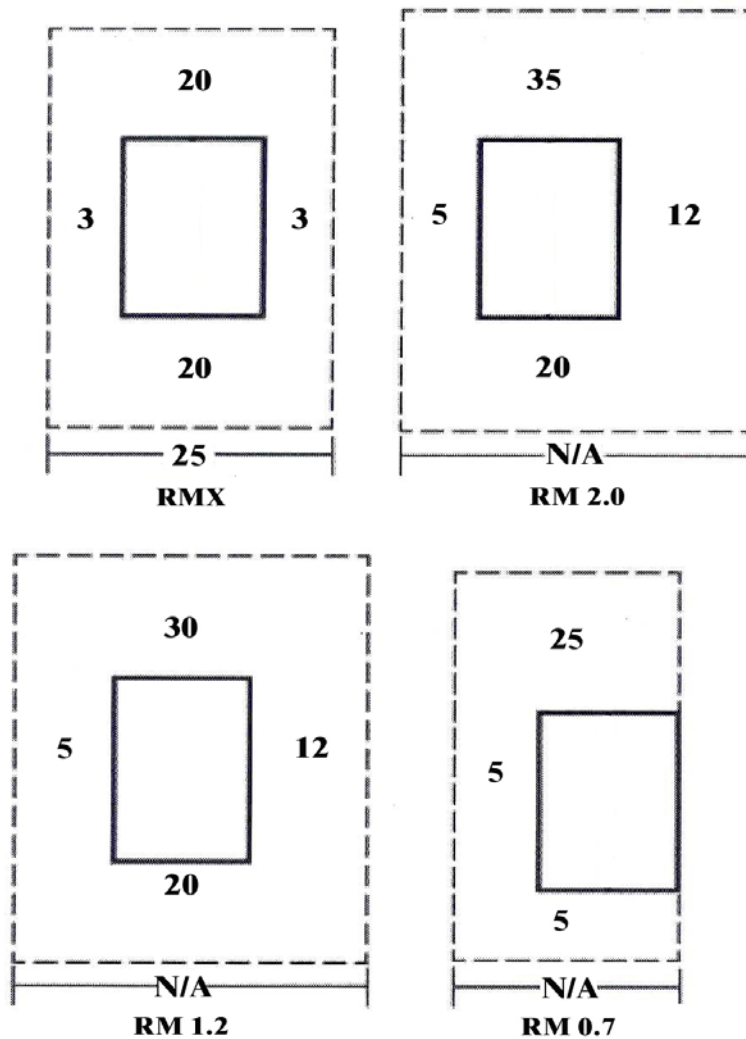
Minimum Setbacks for Multi-family Buildings 35 ft. in Height
